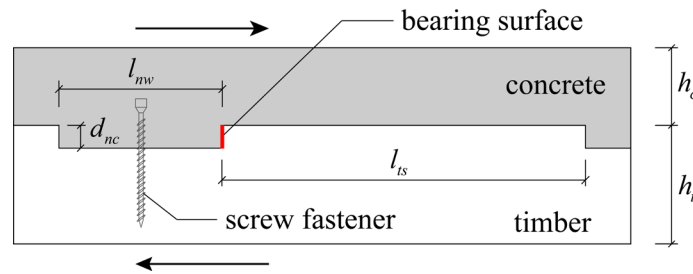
Notched connection geometry (l_{nw} : notch length; d_{nc} : notch depth; l_{ts} : timber shear length; h_c : concrete thickness; and h_t : timber thickness)
